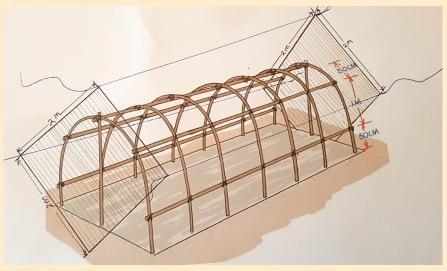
Placing the end pieces on the frame and joining with manila strings.
